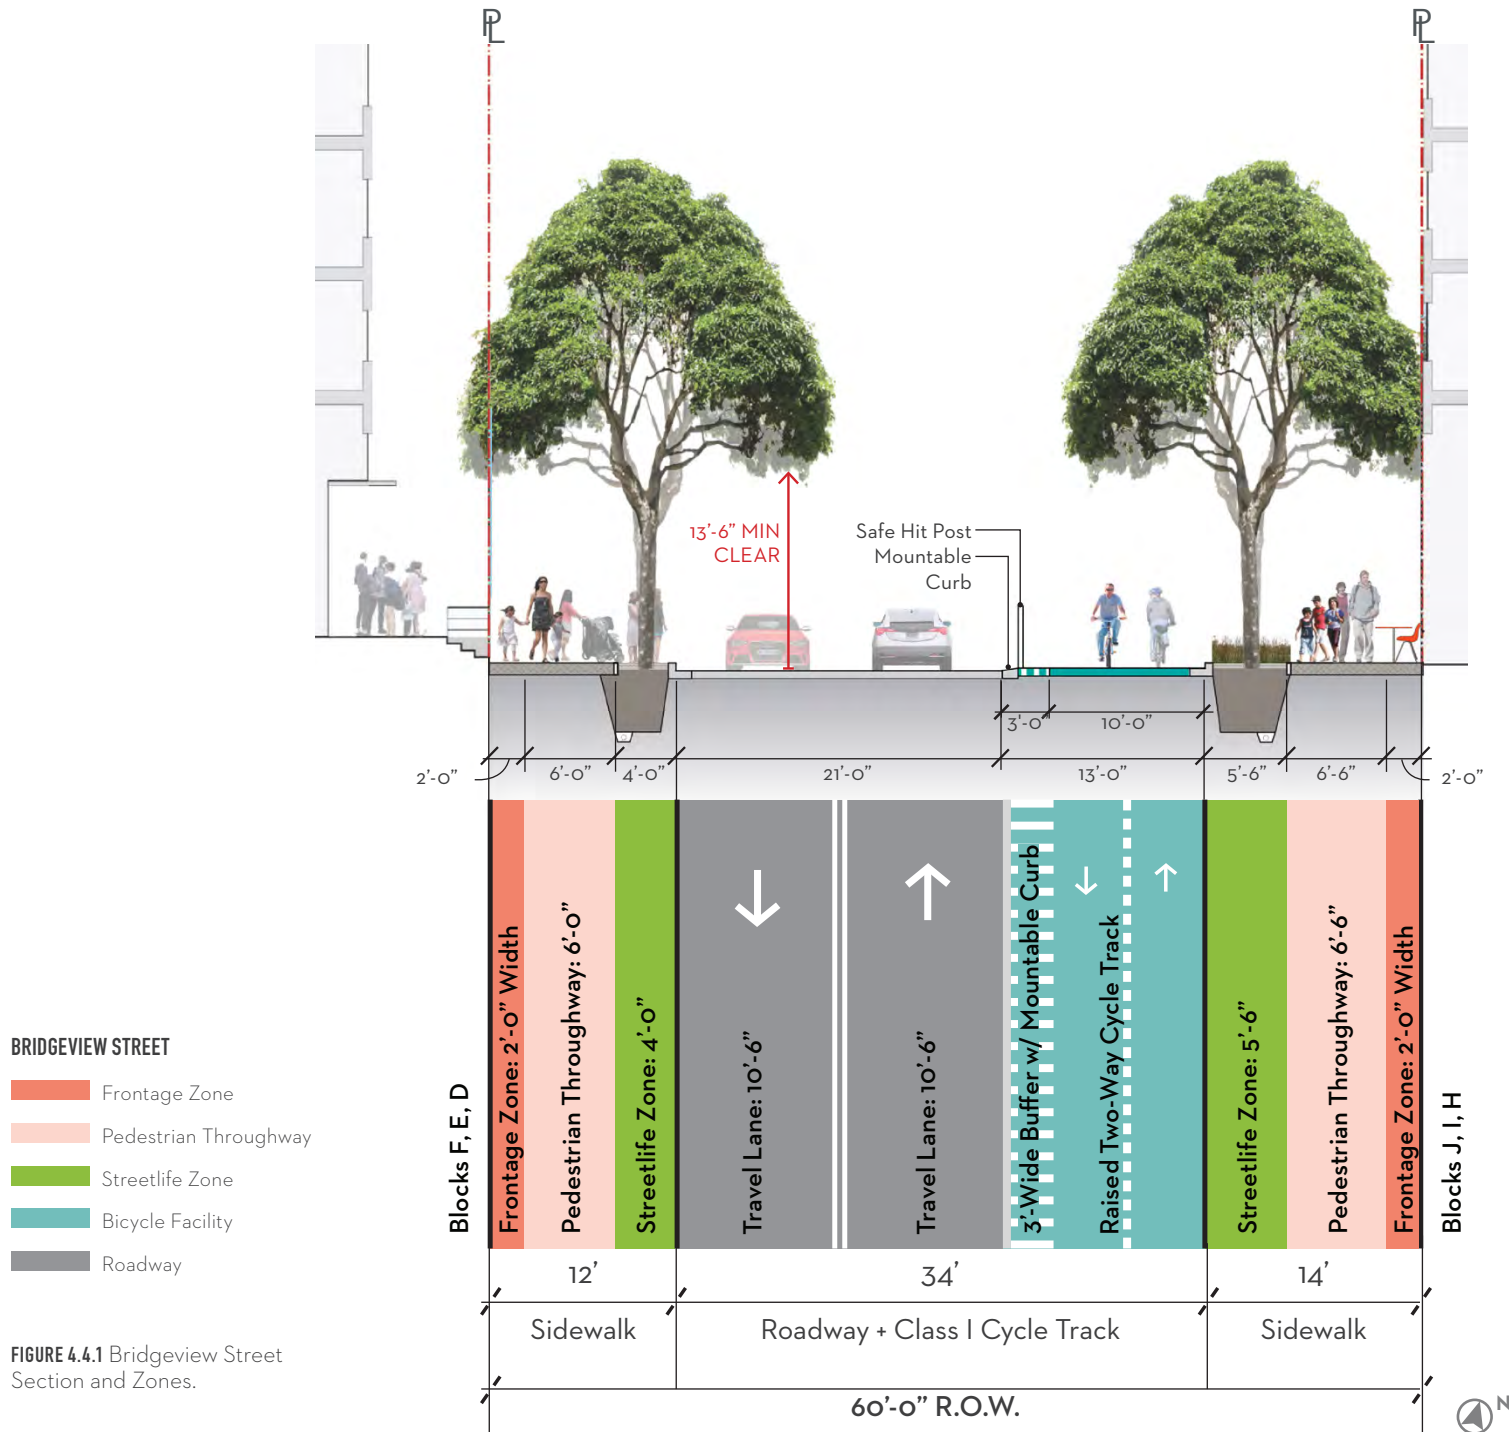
Bridgeview Street Section and Zones.
